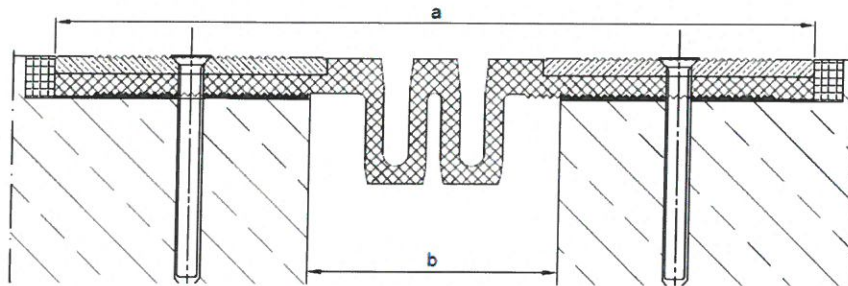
CONECTO PARK SL 210.50.W waterproof expansion joint profile – recessed installation
